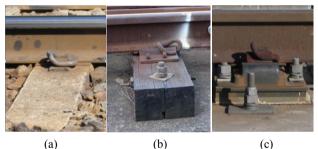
Track conditions at three measurement sites (a) ballasted track on a curve (b) timber sleepers directly fixed to a concrete viaduct (c) track with resilient fasteners direct-fixed to a concrete bridge deck.
